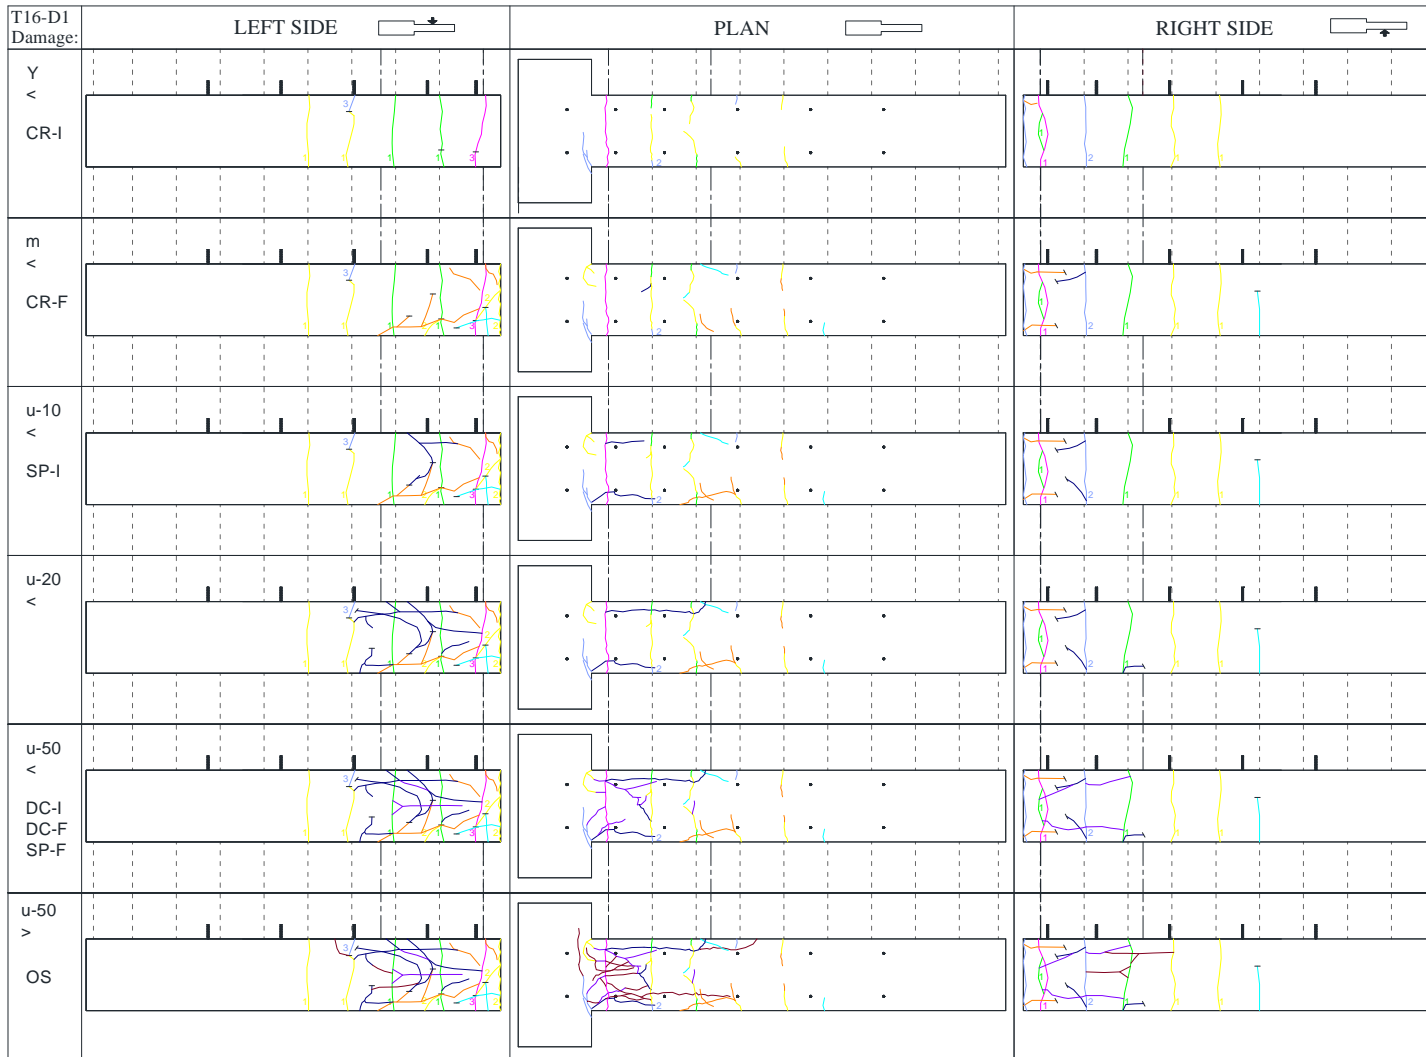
Damage development on column specimen T16-D1 at different damage levels.
